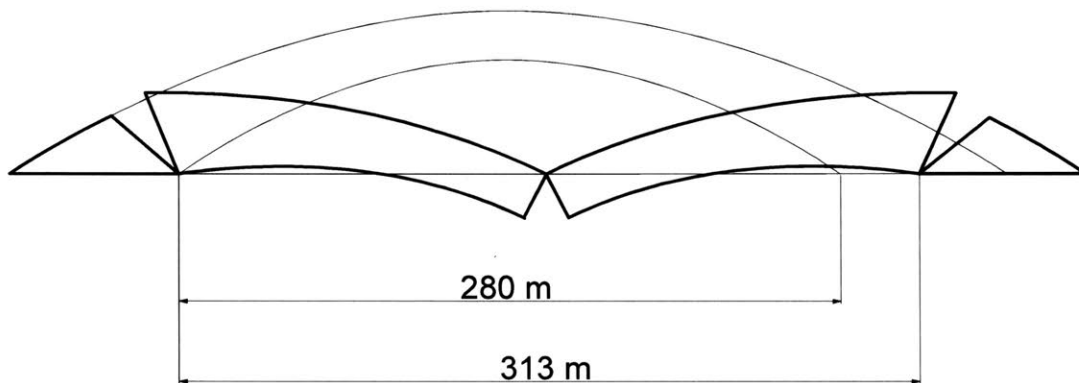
Snap through failure of the full-scale bridge with a three-hinge kinematic mechanism
